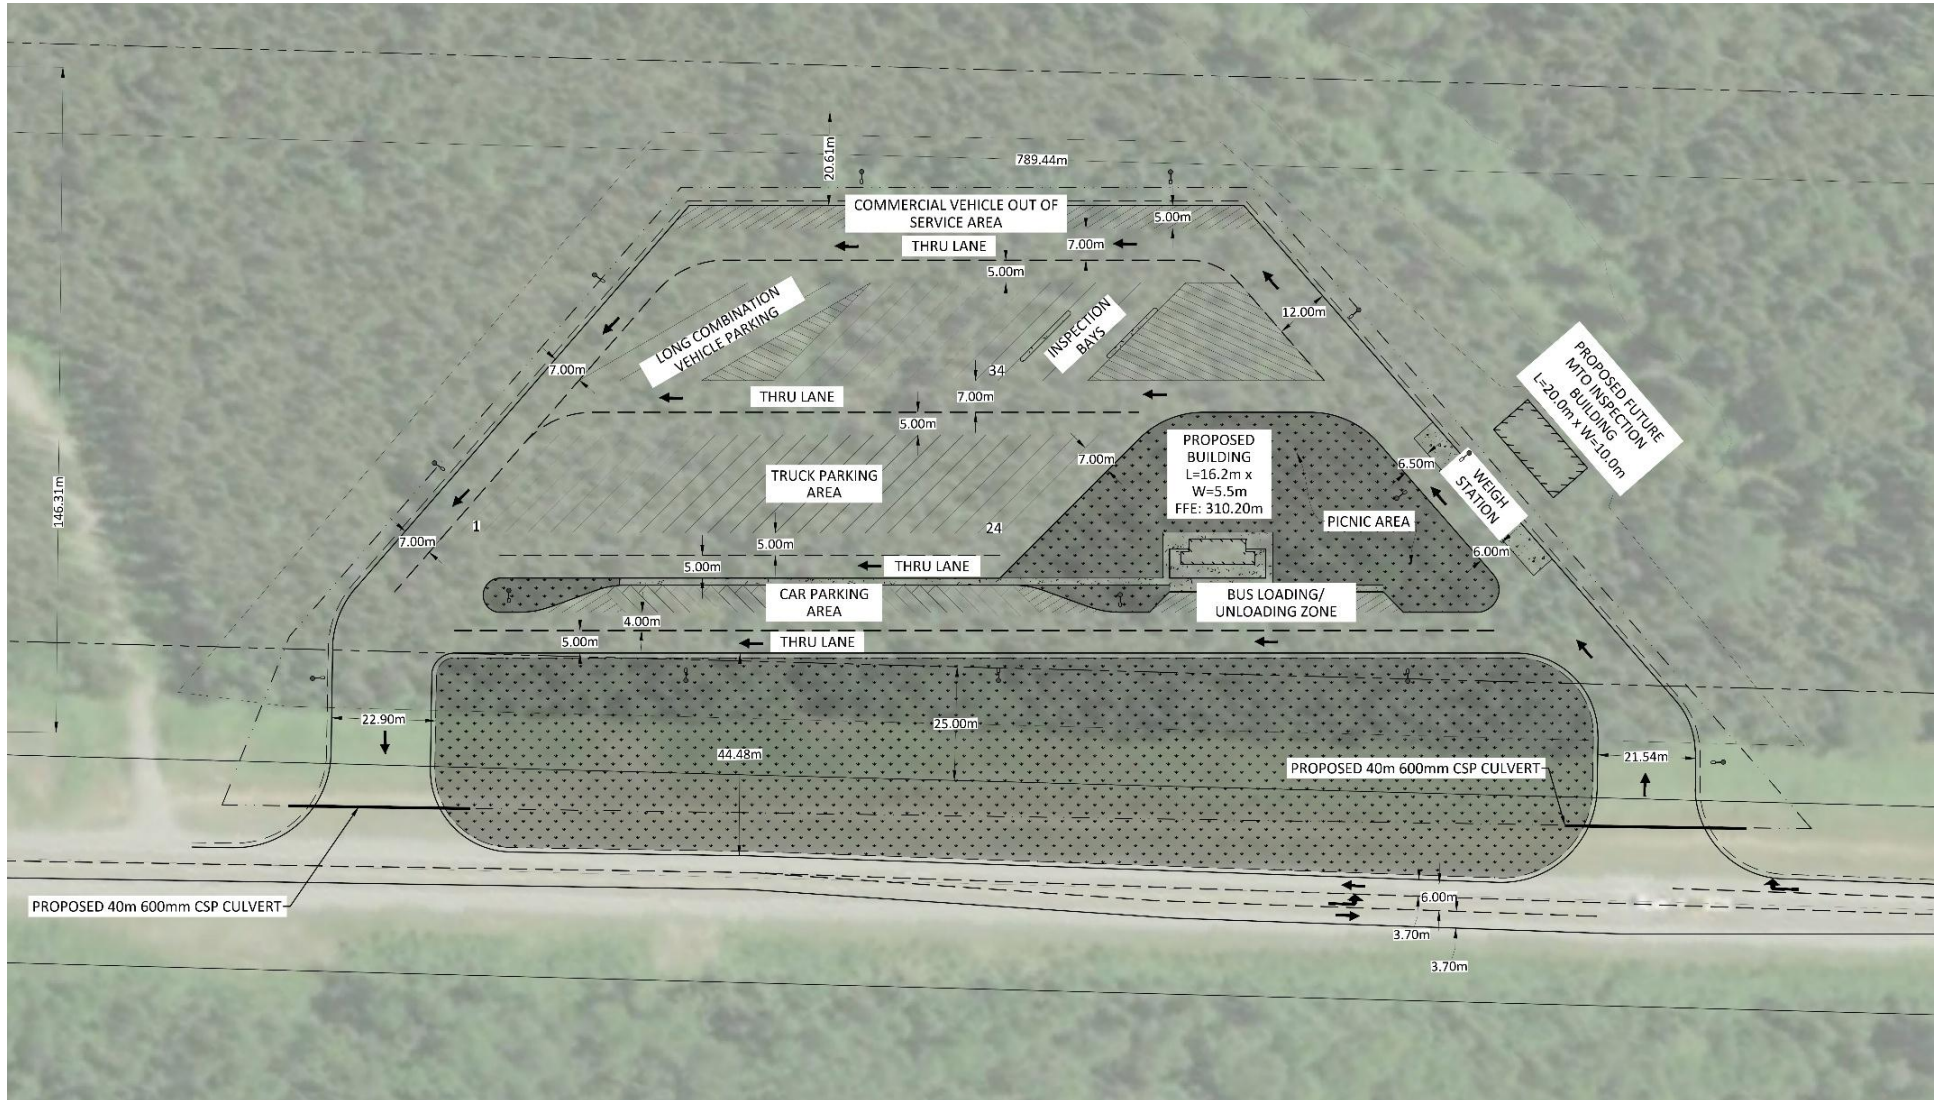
Alternative 2 – Vacant Crown Land Proposed Site Layout
